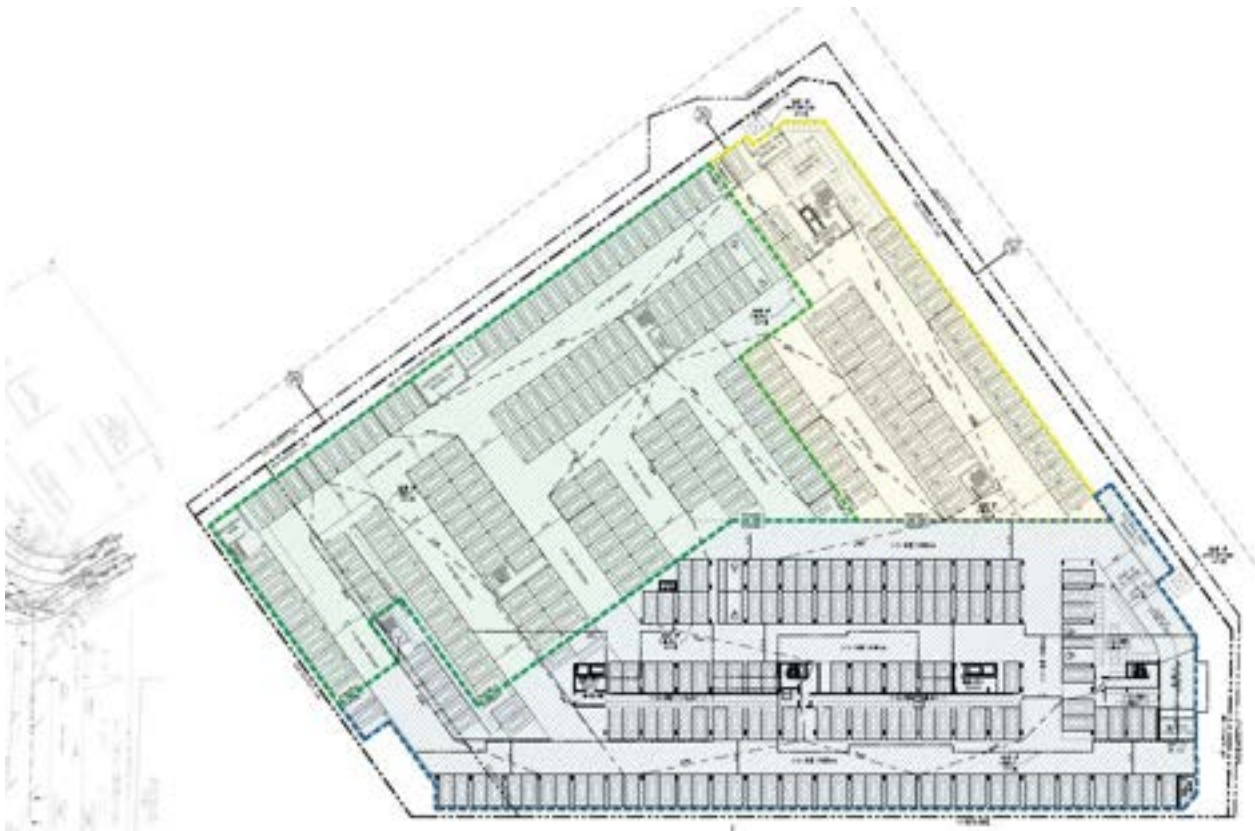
Underground Parking Phasing Plan, prepared by ICON Architects
